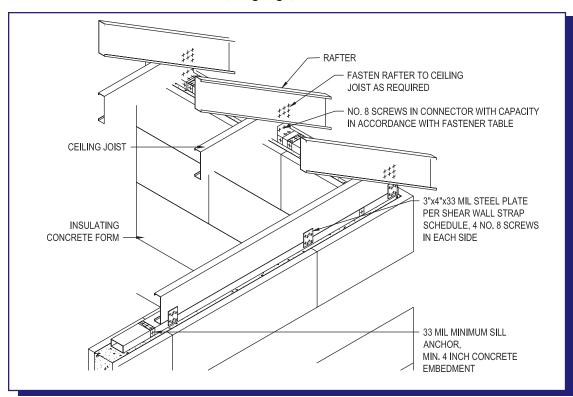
Steel Concrete Anchor Strap and Sill Plate Connection Method at Wall Perpendicular to Ridge
